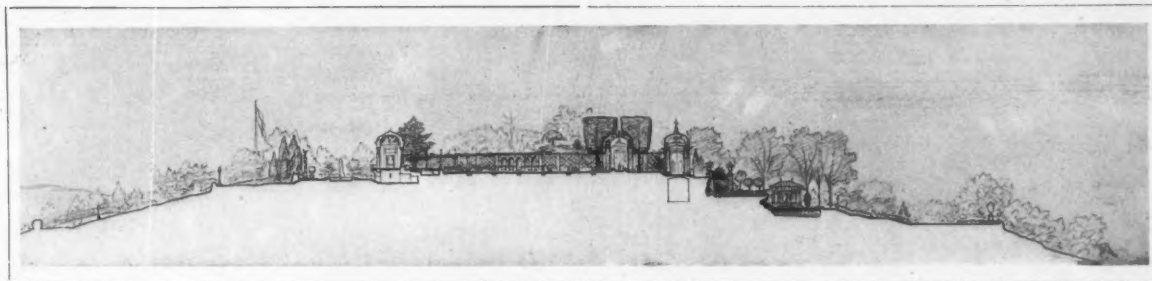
FIG. C—SECTION THROUGH INNER GARDEN AND TERRACES, LOOKING SOUTH: TEA HOUSE AT LEFT, SWIMMING POOL AT RIGHT
